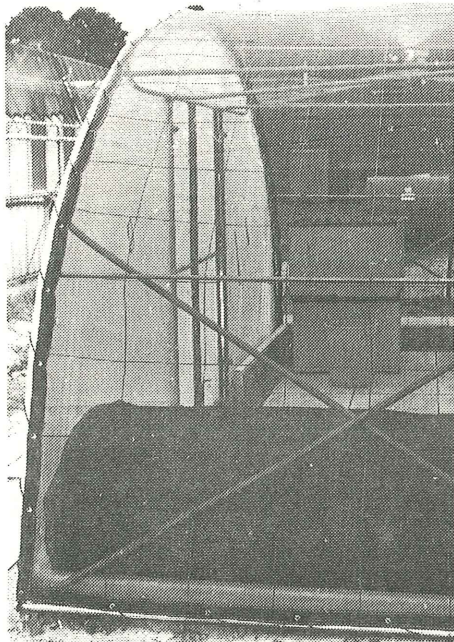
Fastening prefabrication shade-cloth covering to the tunnelhouse frame
